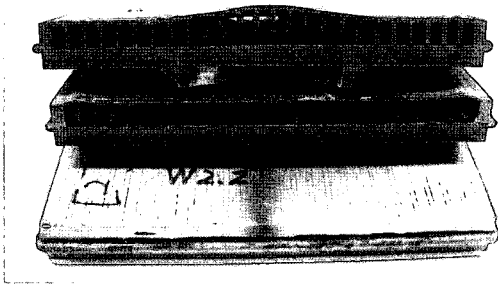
Section View of Plate Specimen after Water Pressure Test
